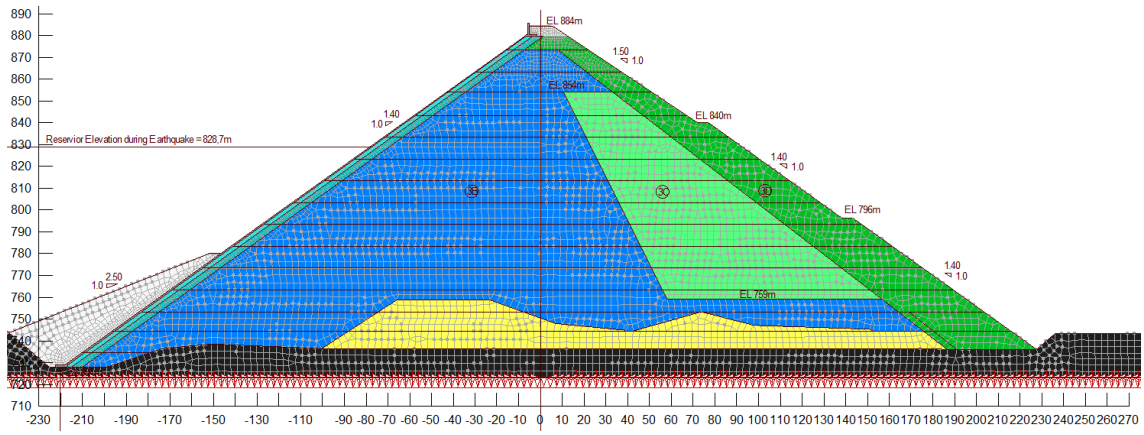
Zipingpu dam model – layered construction – placement of concrete slab and parapet wall
